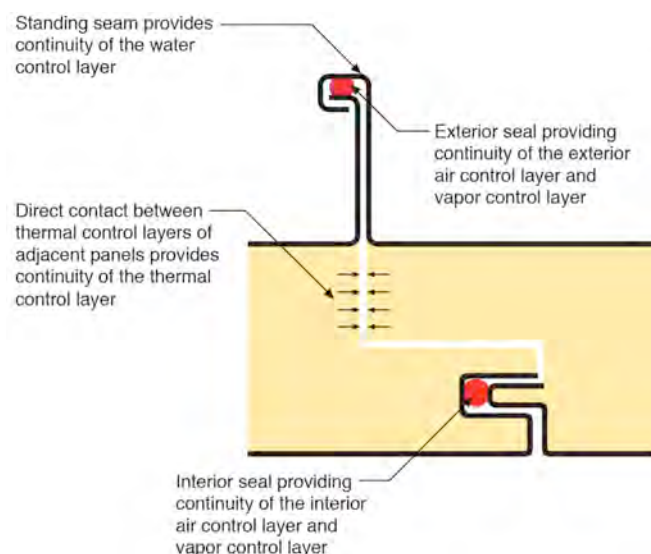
Roof Panel Joint—Water control is provided by a “standing seam” and gravity. Air and vapor and thermal control are addressed similarly to those of wall panels.
